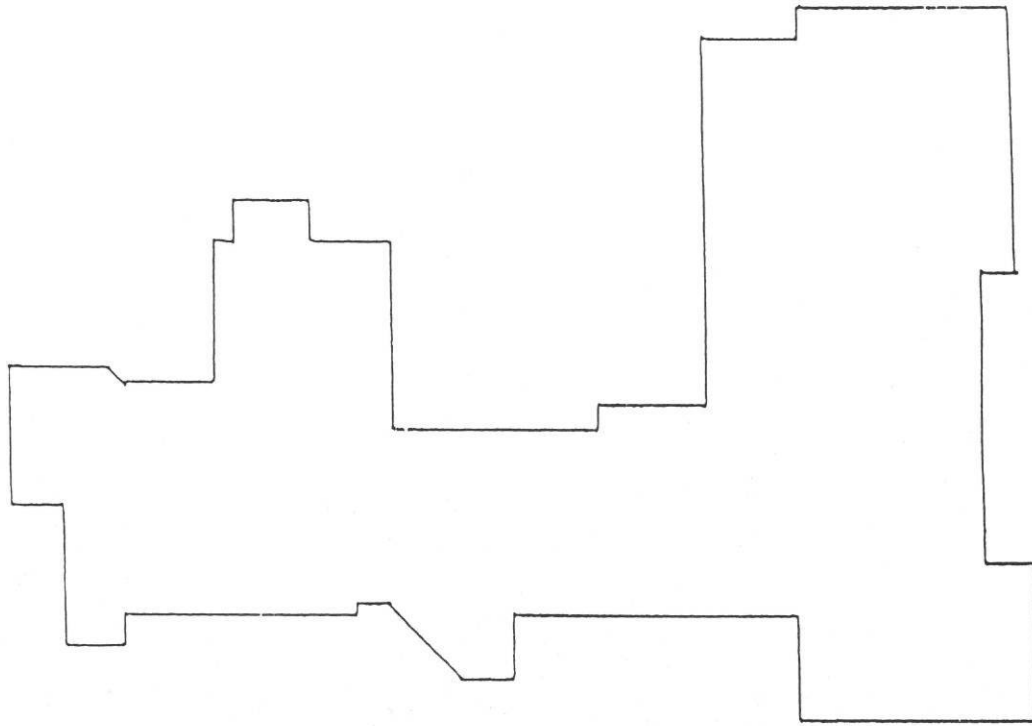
Floor Plan of Dunbar Middle School (DMS) (adapted from Landman, 1996a)
